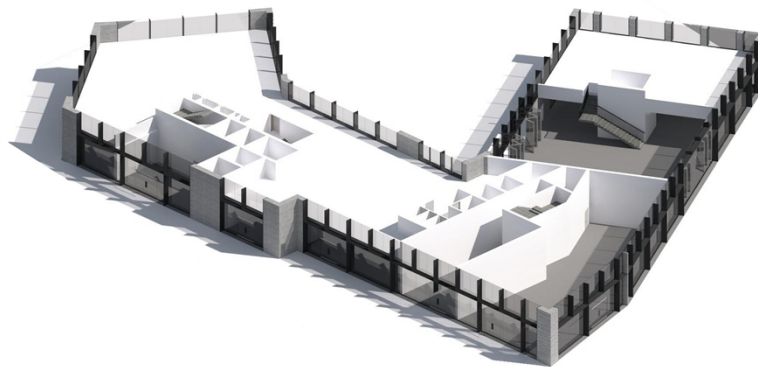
Building 2. Illustrative ground floor with double height space and indicative bi-folding doors to Verney Road and servicing route.
